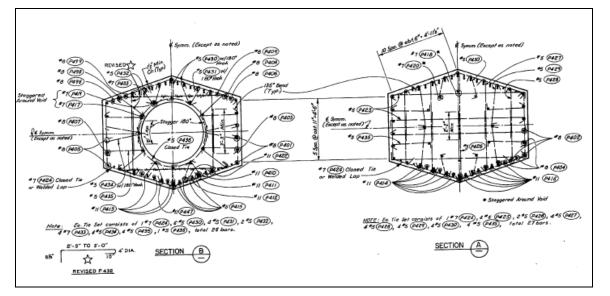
LL Pier 4 Column Reinforcement - drawing 292
